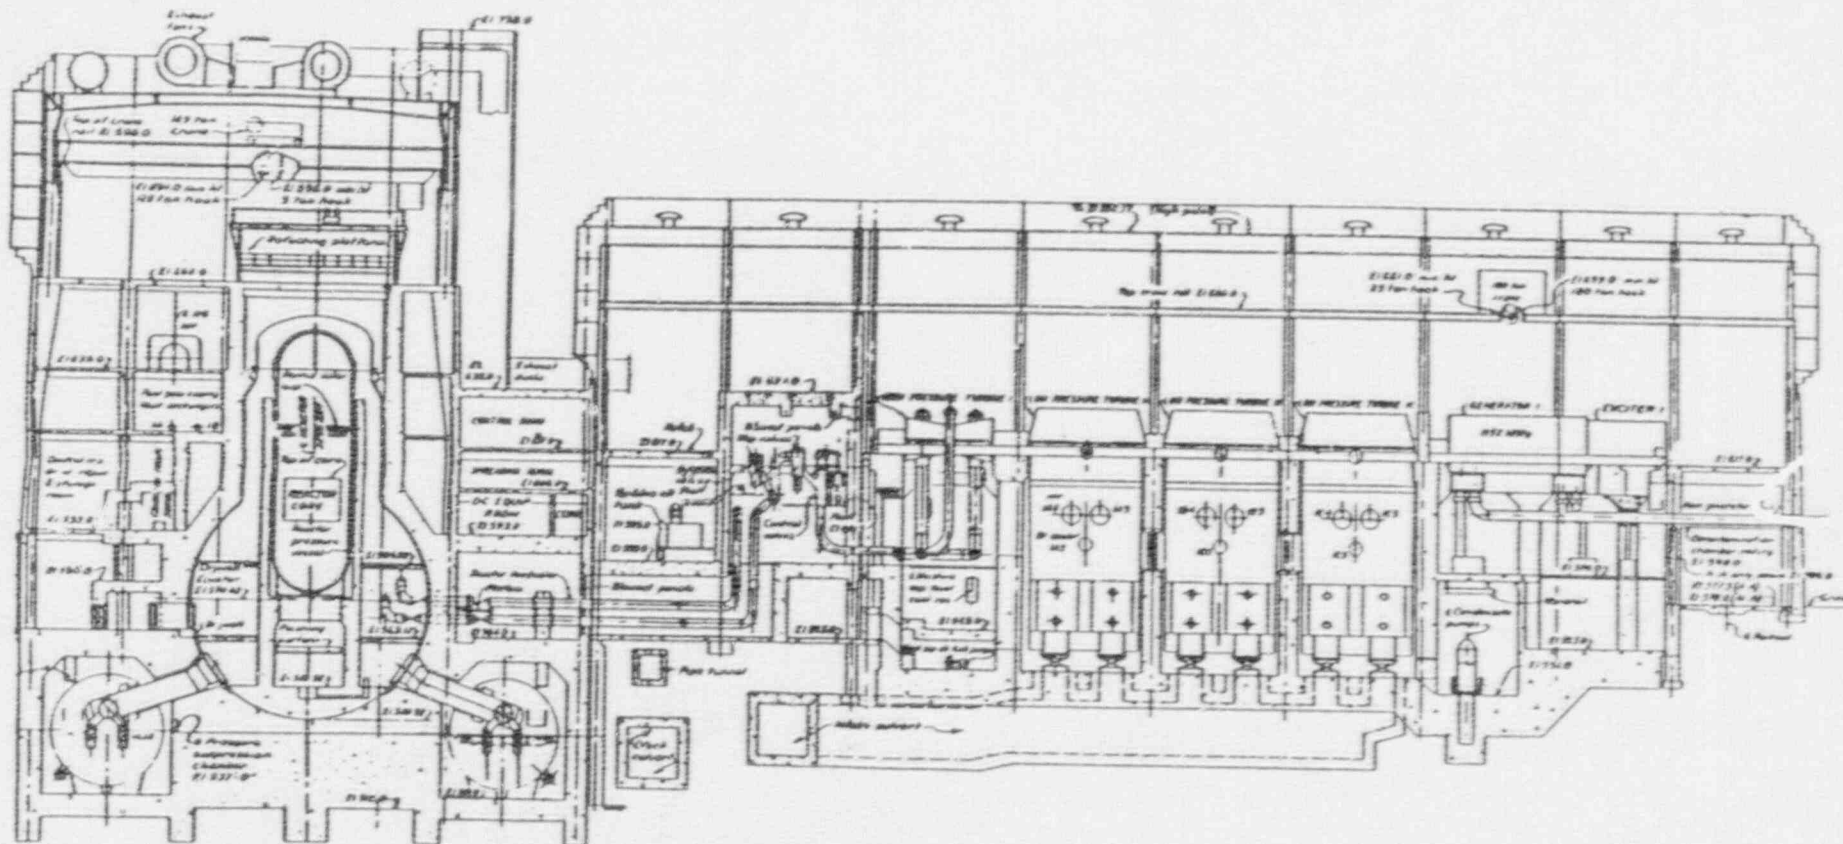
Typical Elevation View of Browns Ferry Reactor and Turbine Buildings
